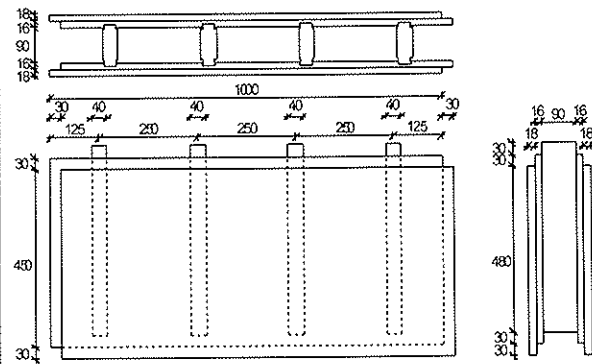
Scheme of Prefabricated Timber Wall Element, dimensions in mm
